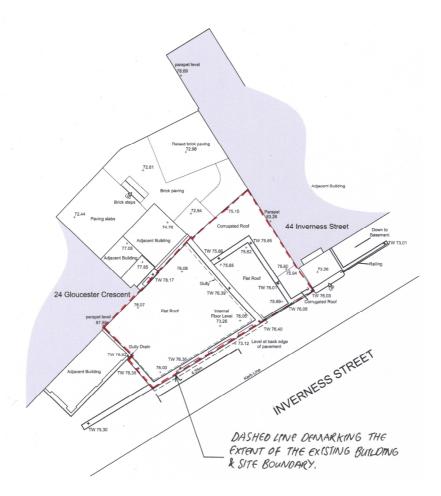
Existing site plan (note: full size version of the existing site survey is included in appendix B)
